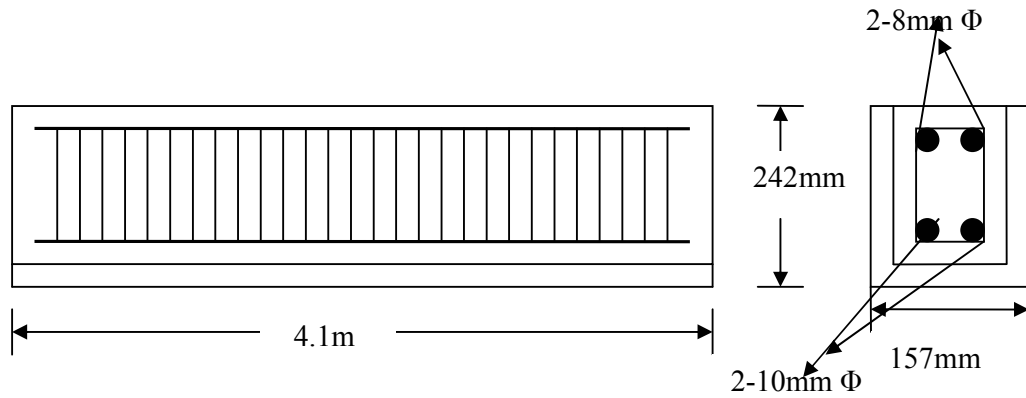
Longitudinal and Cross-Section of Retrofitted Beam
